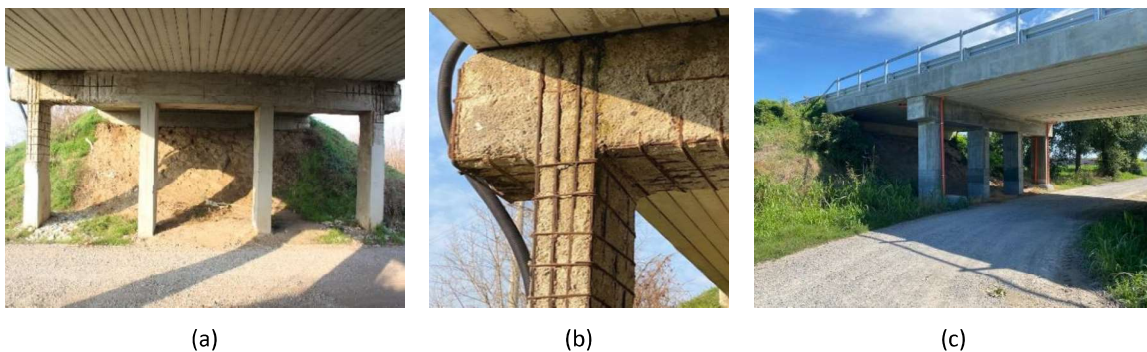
Bridge before intervention (a), detail of corrosion (b), and bridge after repair (c).
